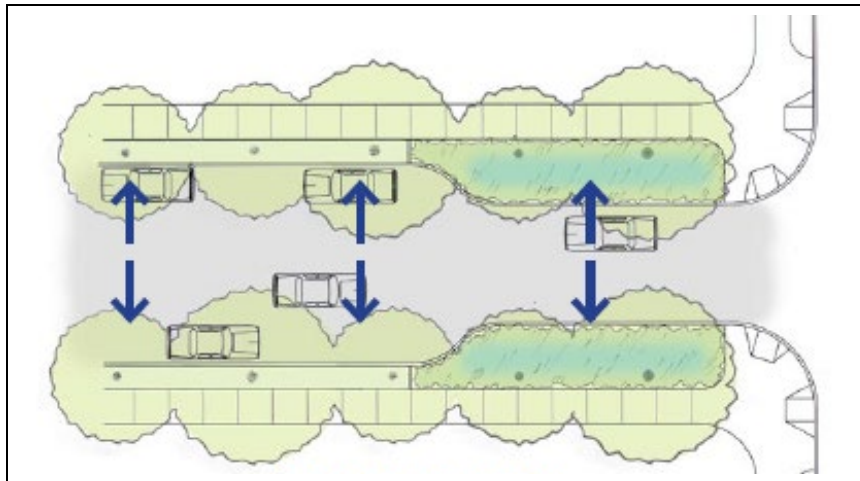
Crowned Street Profile. A crowned street is designed so that the highest elevation is in the middle of the street, such that stormwater runoff drains to the sides of the street. GI facilities may be located on either side of the street.
